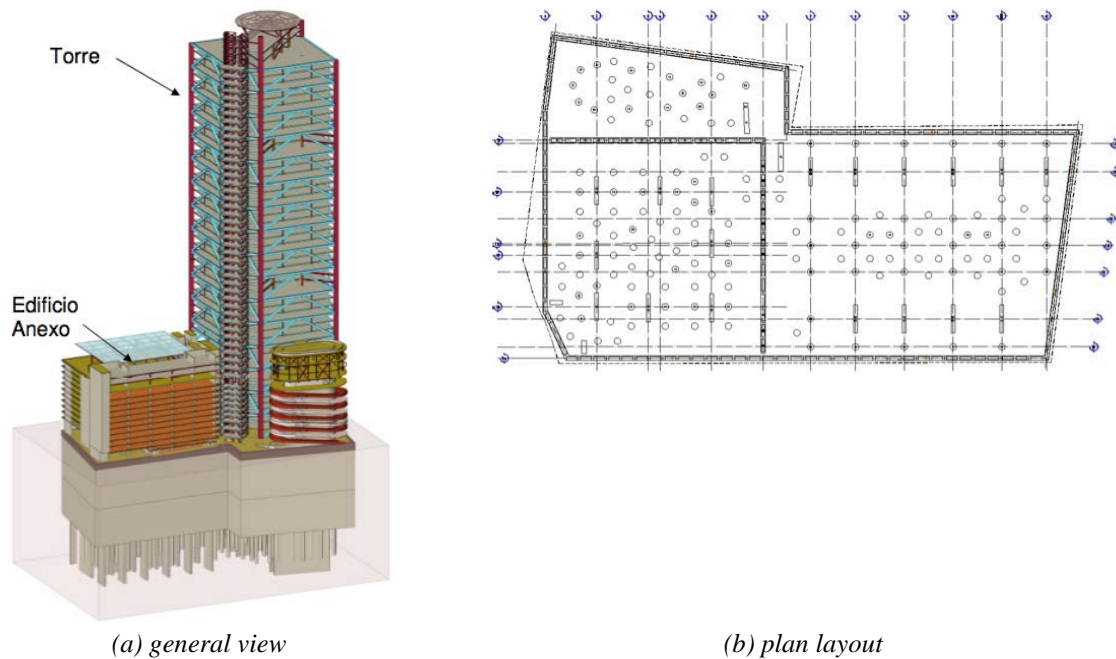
, Typical building with peripheral slurry wall, used as part of the foundation, after Meza et al (2012)
